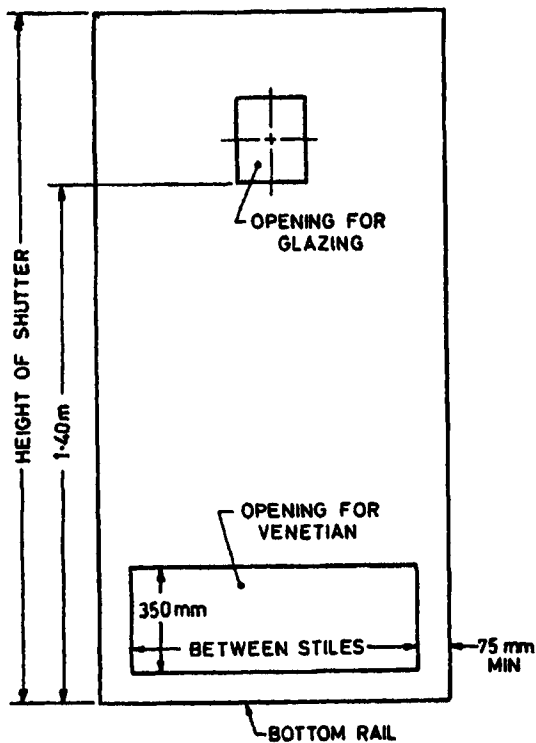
TYPICAL LOCATION OF OPENINGS FOR GLAZING AND VENETIAN
